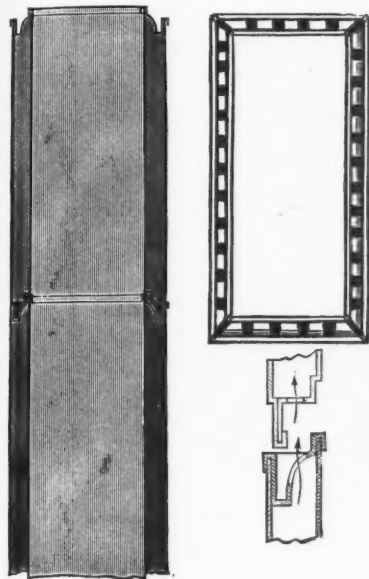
SECTIONAL VIEWS, SHOWING CONSTRUCTION OF PIPE AND JOINTS.
